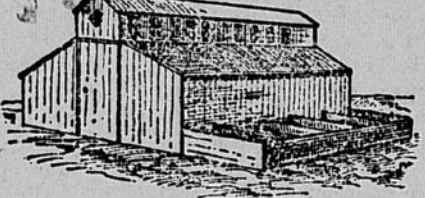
OUTSIDE VIEW OF PIGGERY.
